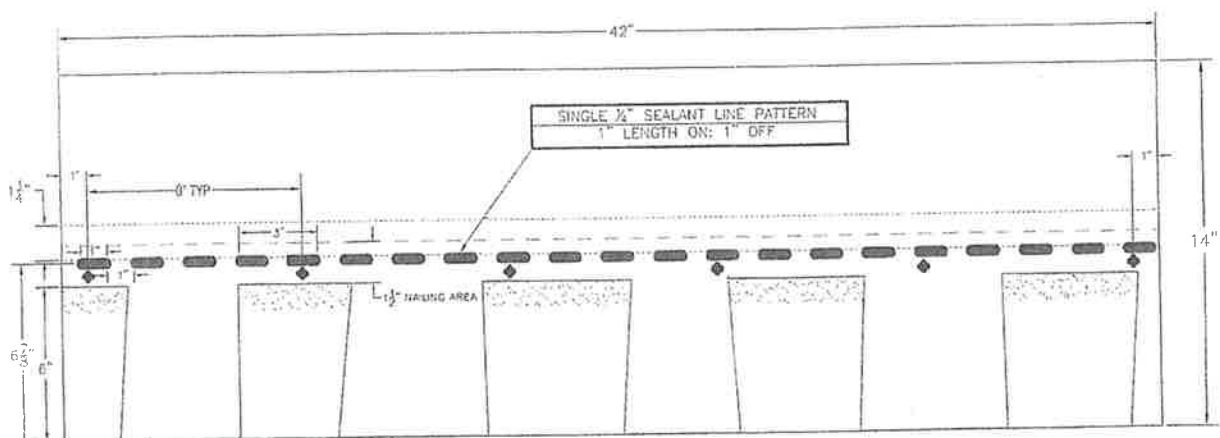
ProLAM™ Architectural Shingle 6 Nail Pattern
